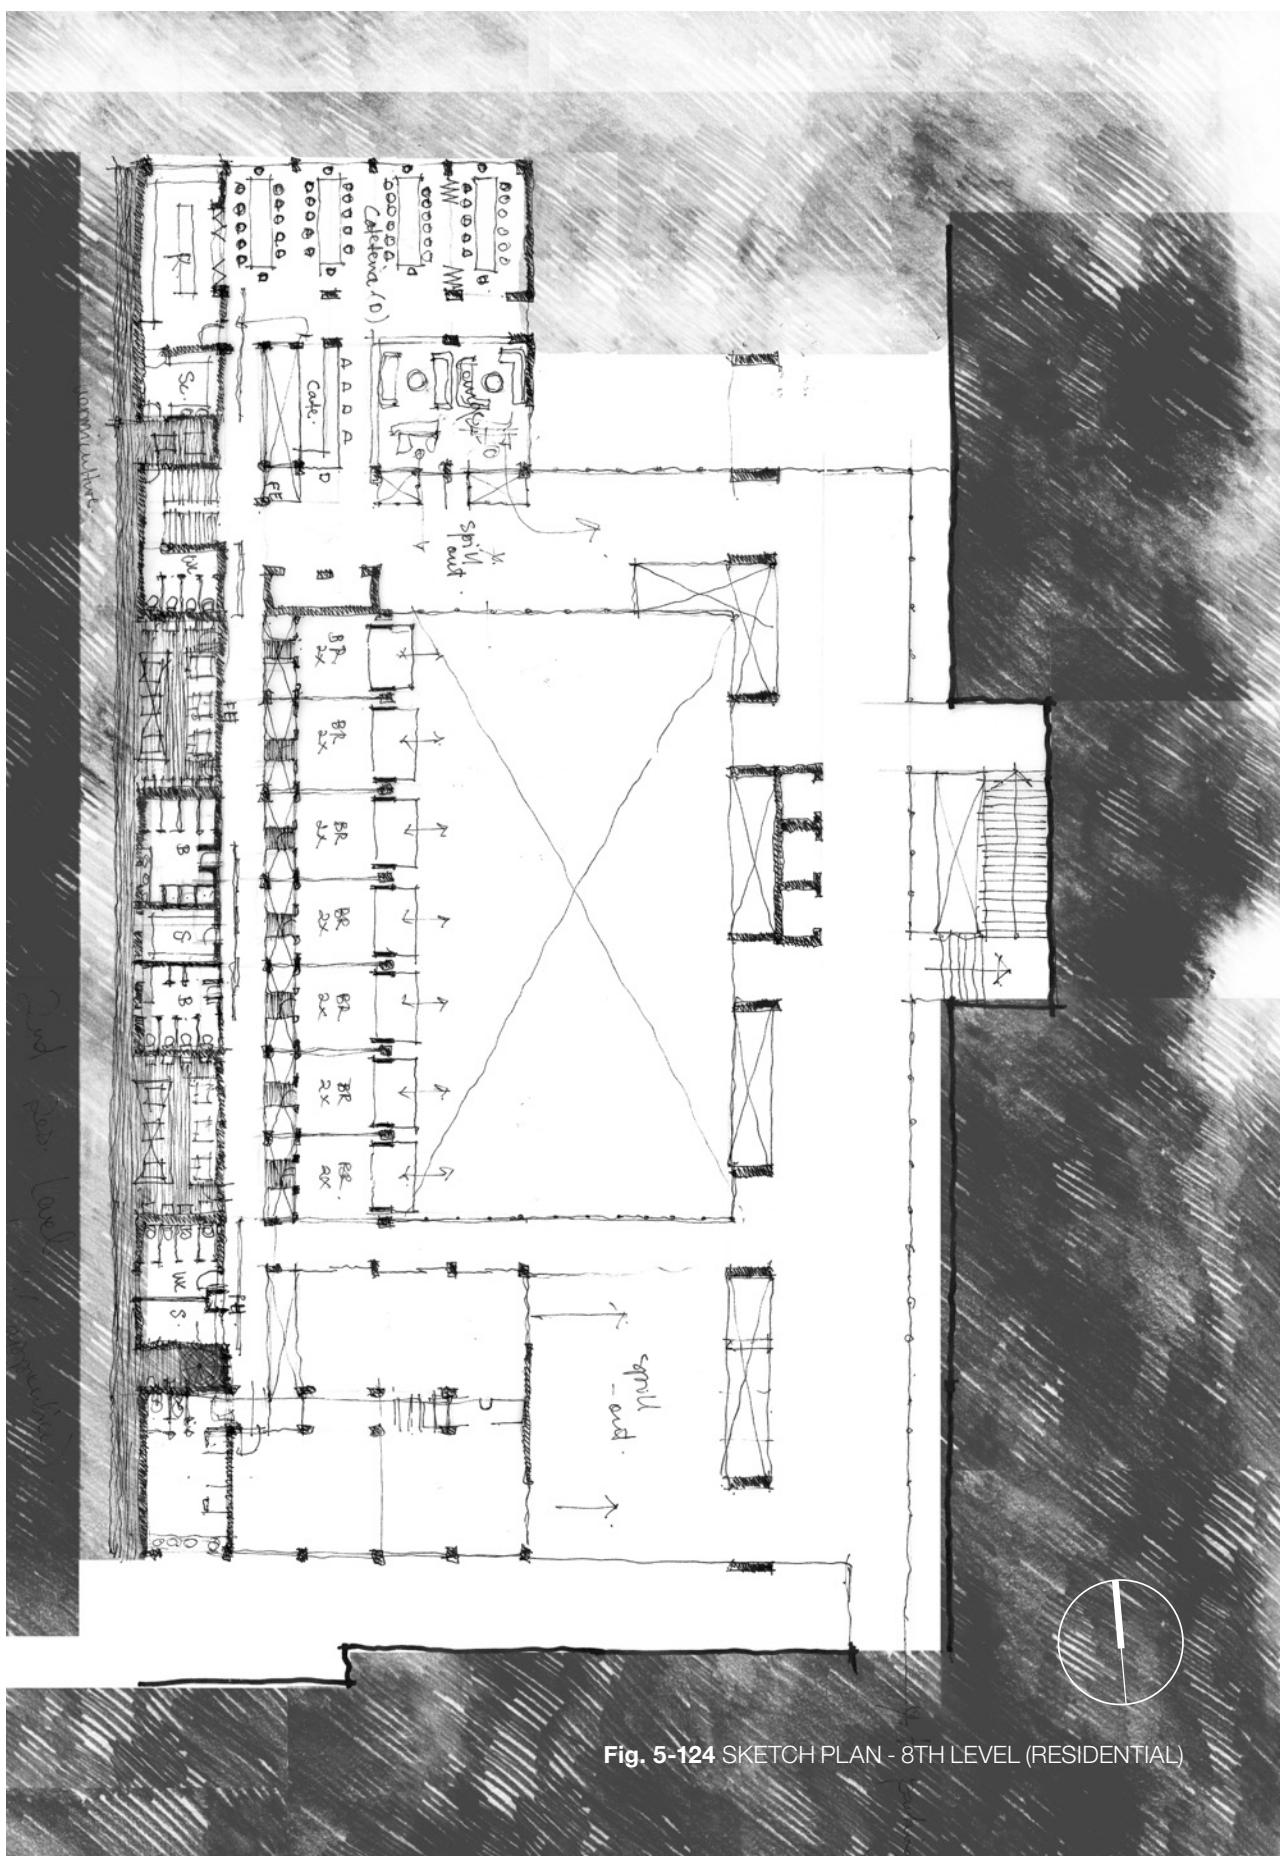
SKETCH PLAN - 8TH LEVEL (RESIDENTIAL)
